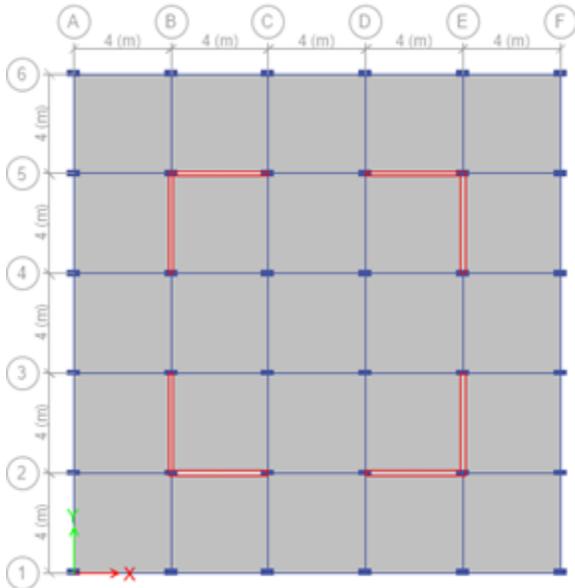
Plan of shear wall at corner of 2nd grid
